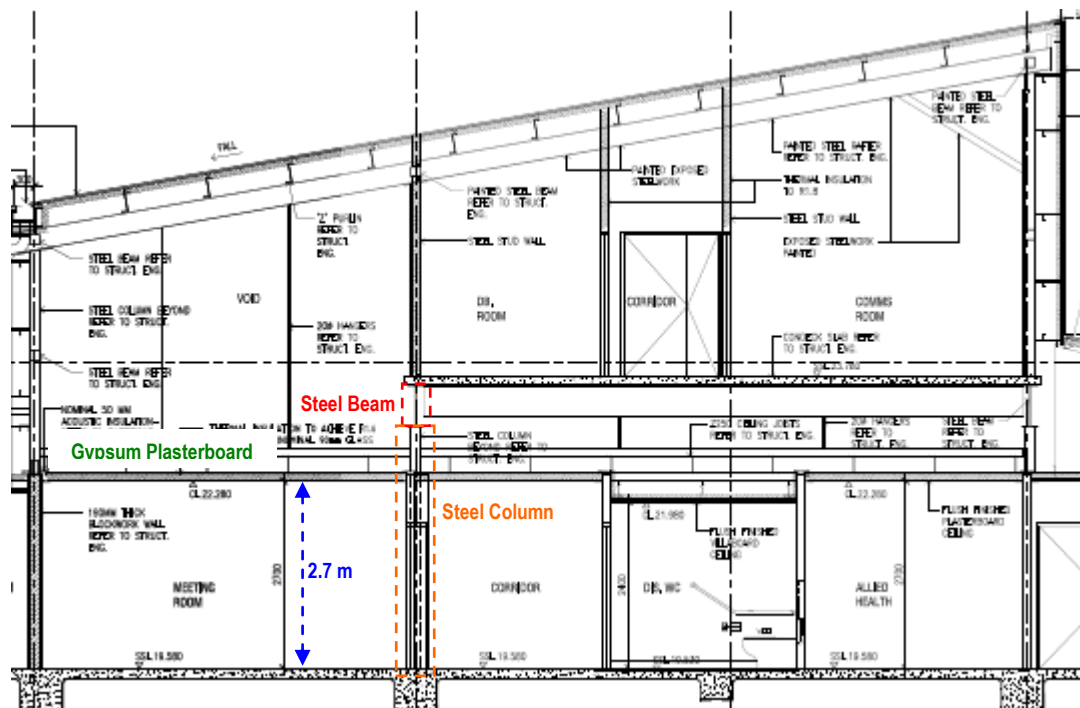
Cross-section of MEH building towards the West end of the North block
